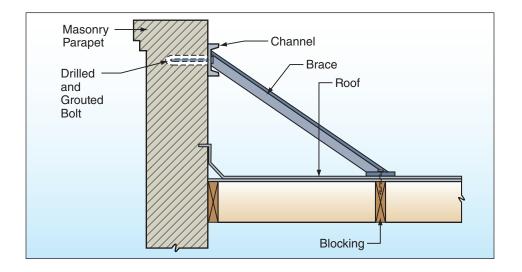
Bracing for existing unreinforced masonry parapet wall
